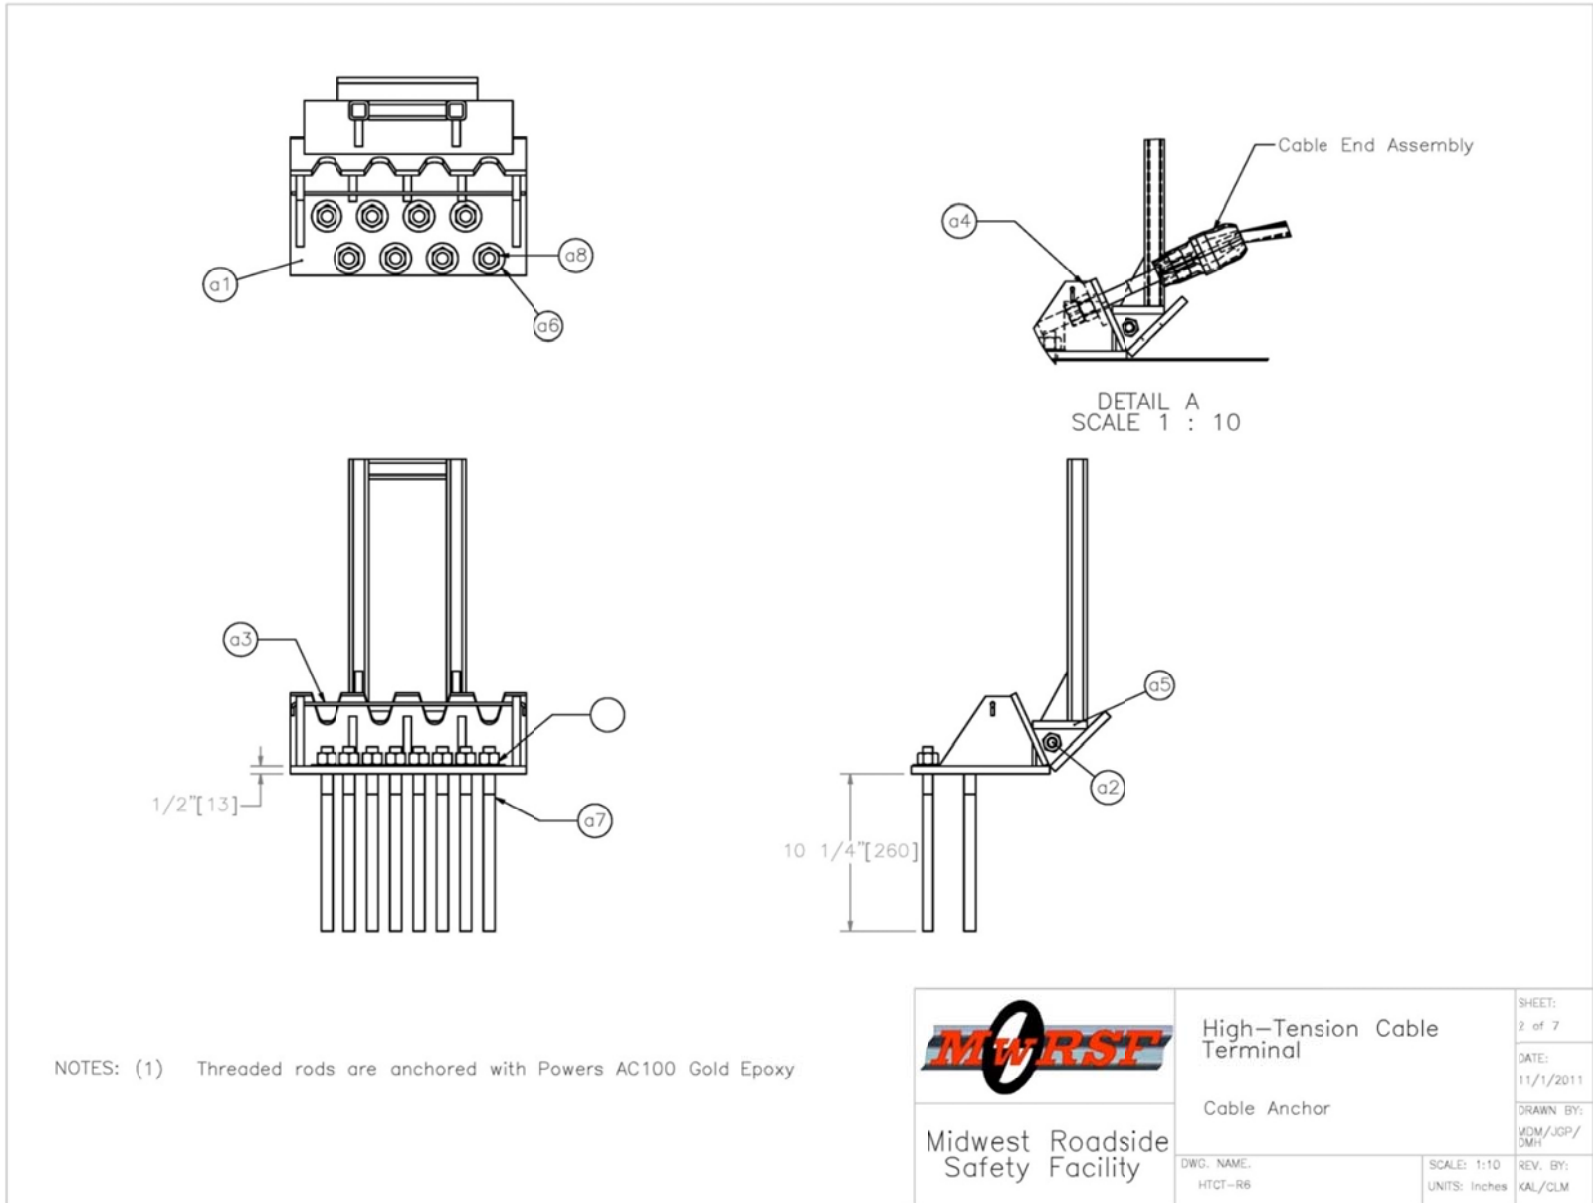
Cable Anchor Bracket Assembly Details, Test No. HTCT-1
